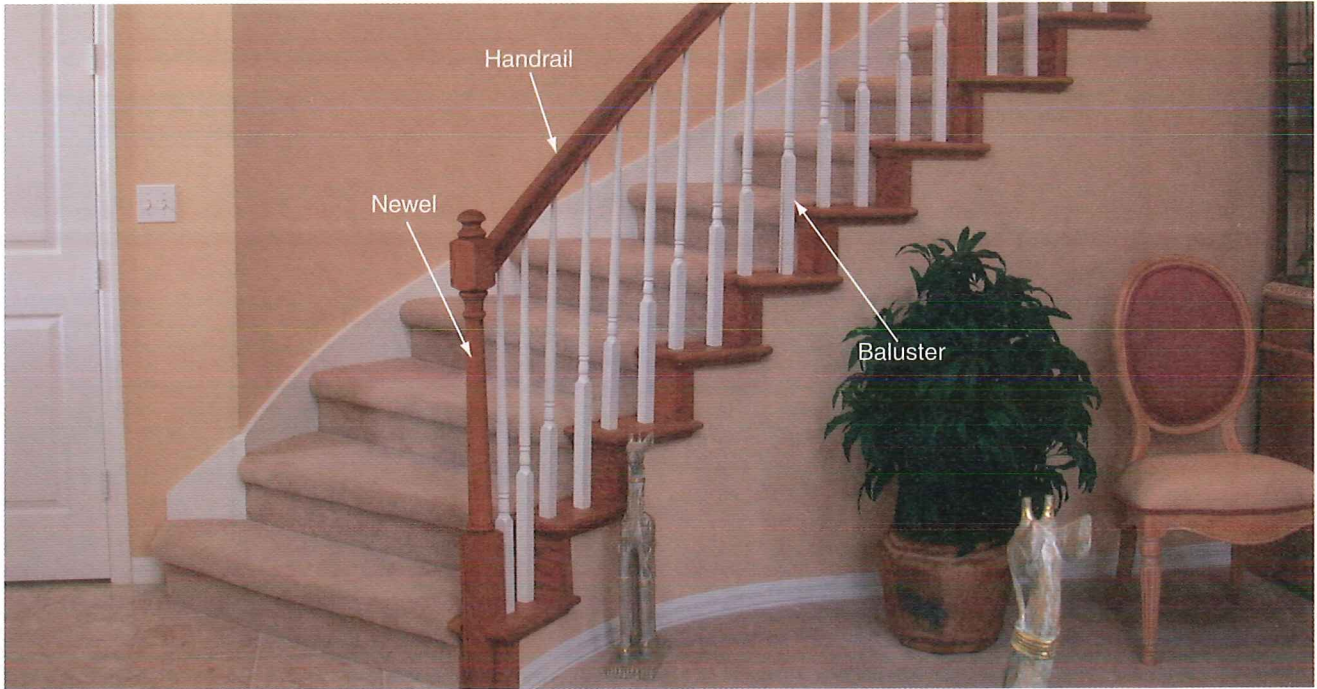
The newel, handrail, and balusters are identified on this stairway. These are open stairs.
